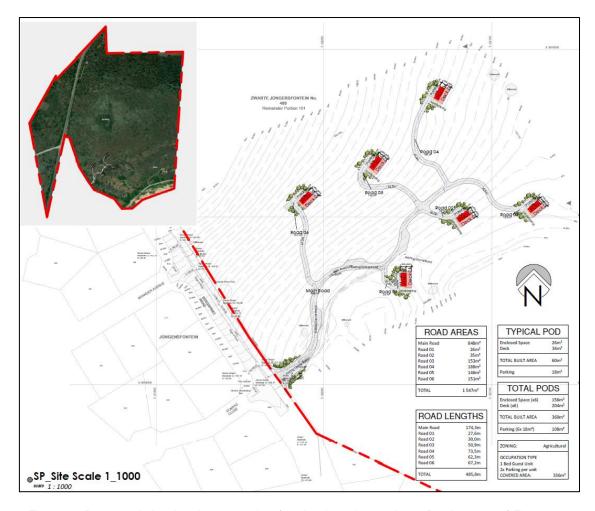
Proposed site development plan for six glamping pods on Portion 101 of Farm 189 Jongensfontein.
